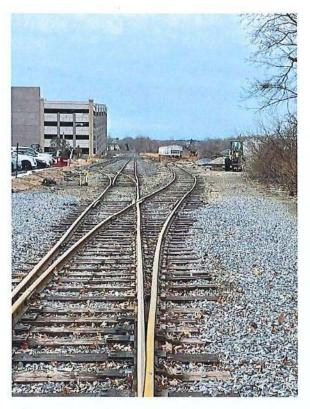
Railroad tracks looking southwest from Maplewood Ave. Taken 1/19/23
